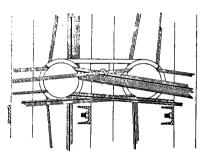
Line Drawing Designed to Illustrate How Jumpers, Ideally, Should Enter and Leave Rings.
